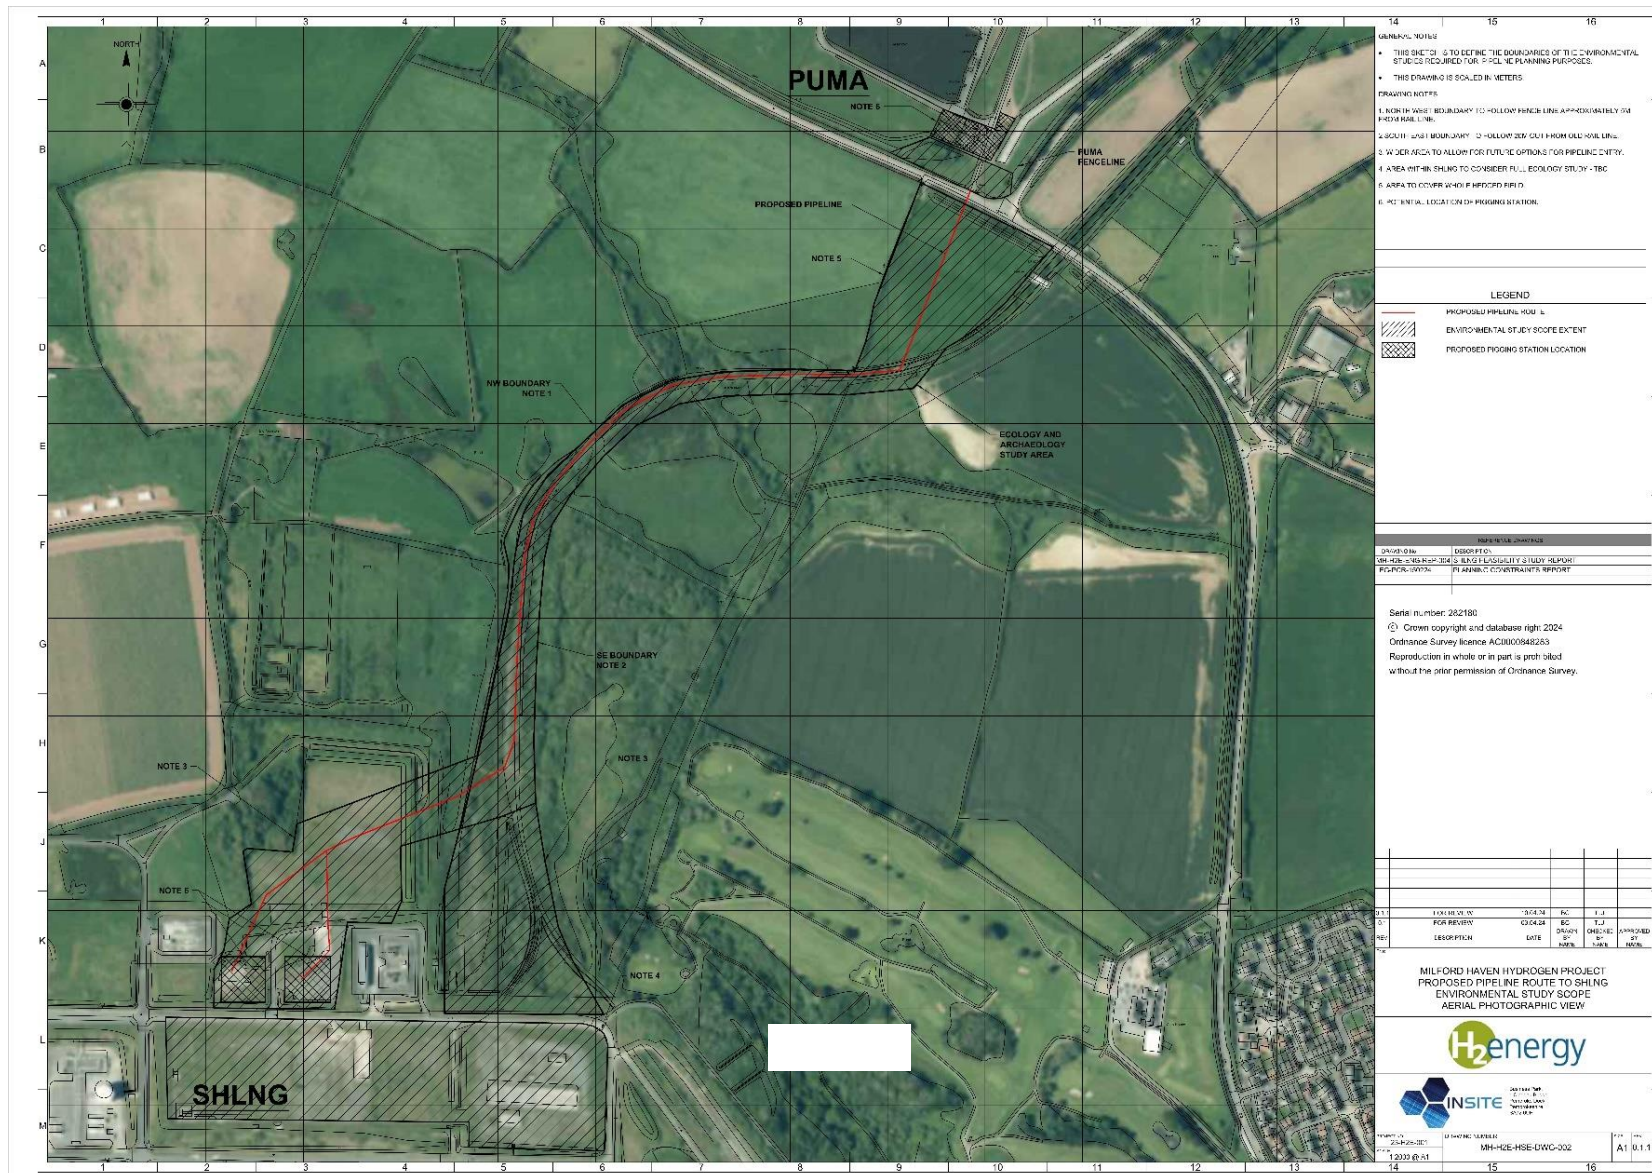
Detailed site and development location plan. Plan provided by the client, not reproduced to original scale.
